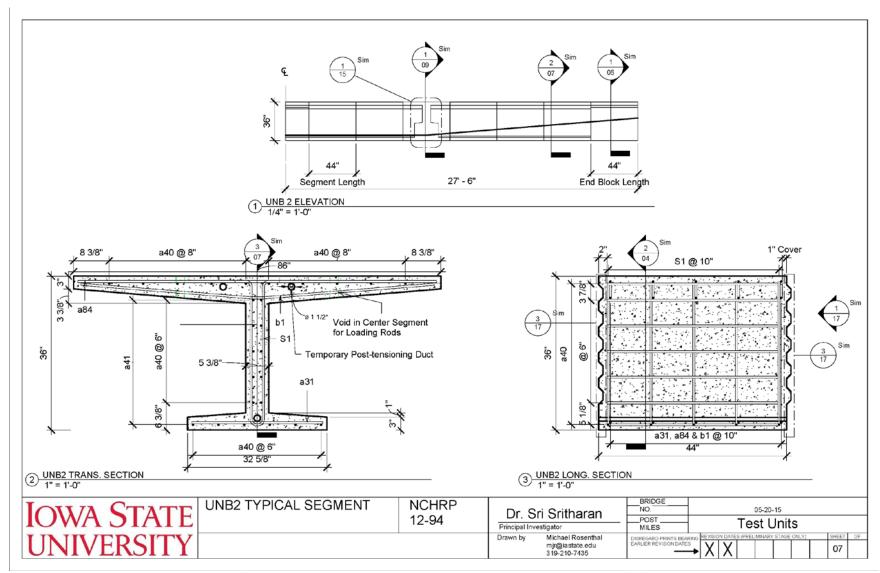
UNB2 Typical Longitudinal and Transverse Section
